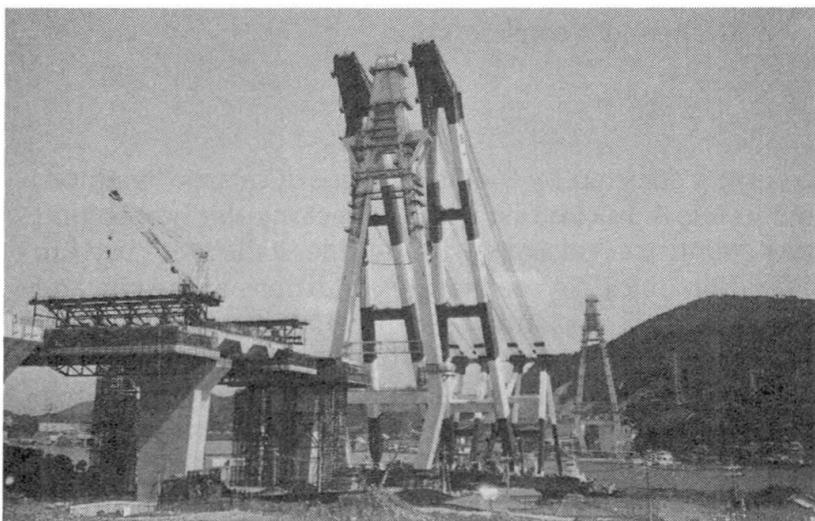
Large block erection: tower of the Ikuchi Bridge (courtesy of the Honshu-Shikoku Bridge Authority)
